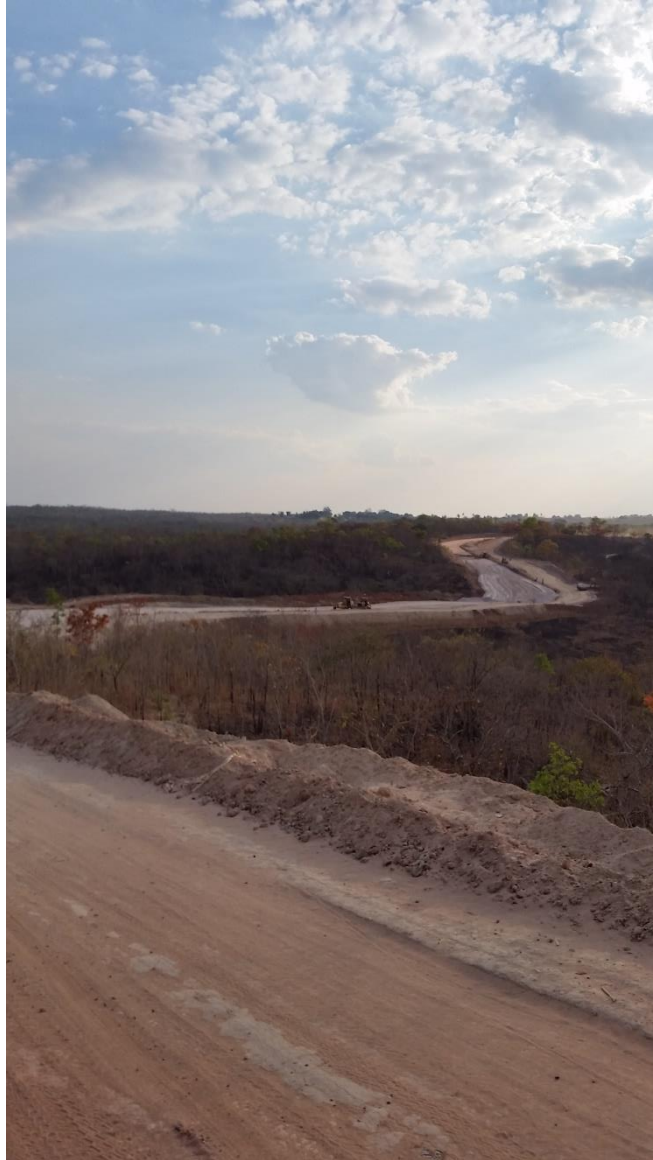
Typical road conditions, Masasi-Songea Road
